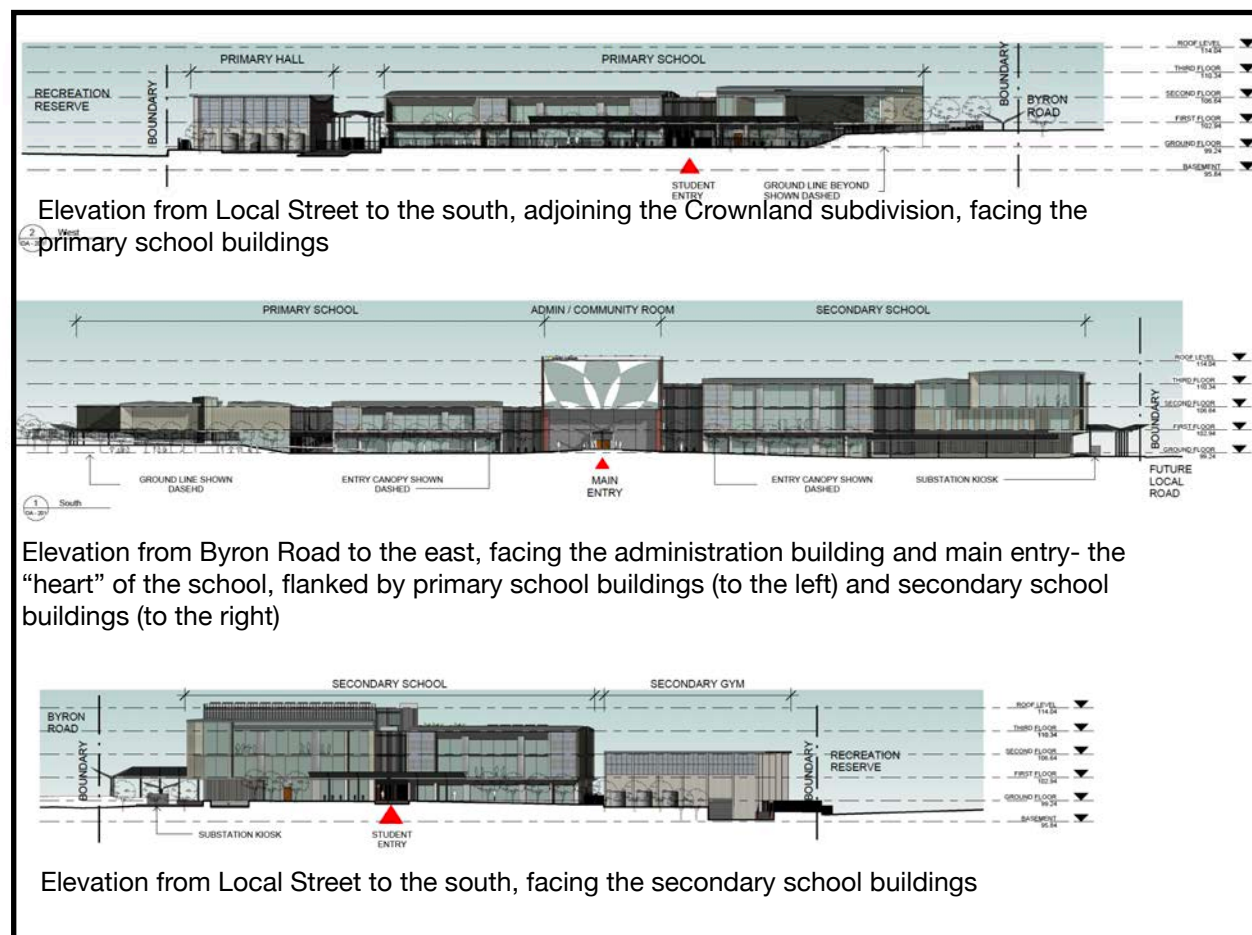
Design principles: articulated facade treatment (elevations)
